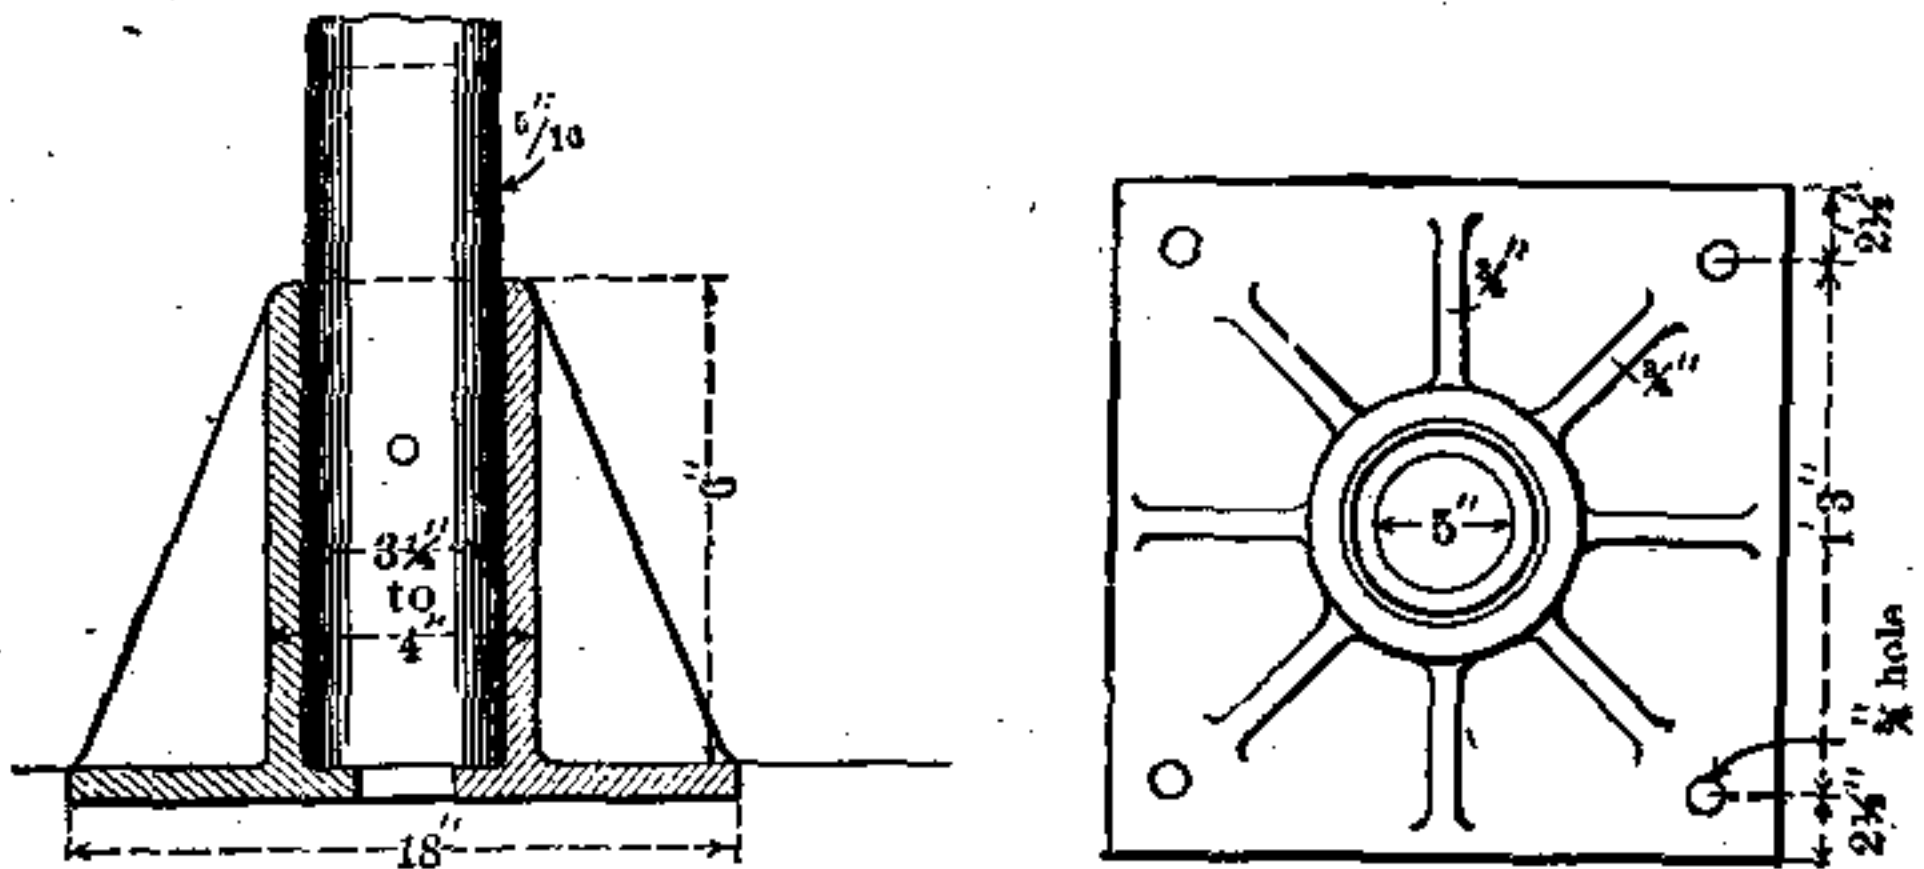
POLE BASE FOR WOOD ROOFS.
